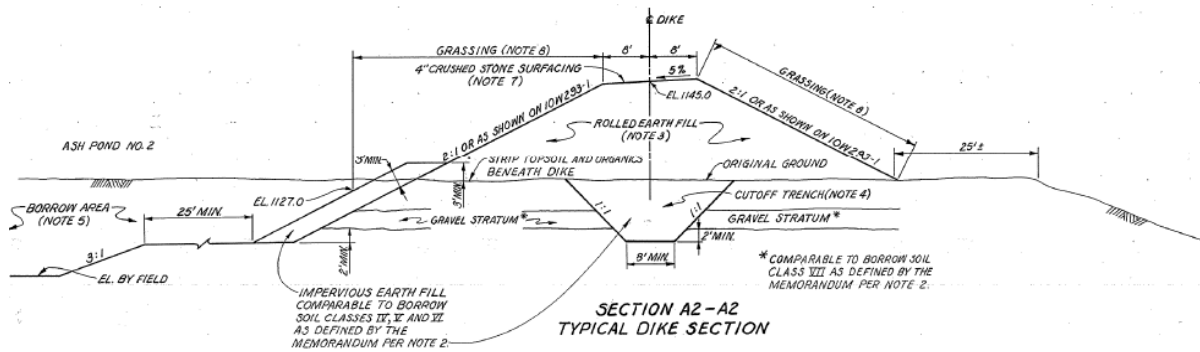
Bottom Ash Disposal Area 2 – Typical Section 1977 (As Built 1980)
